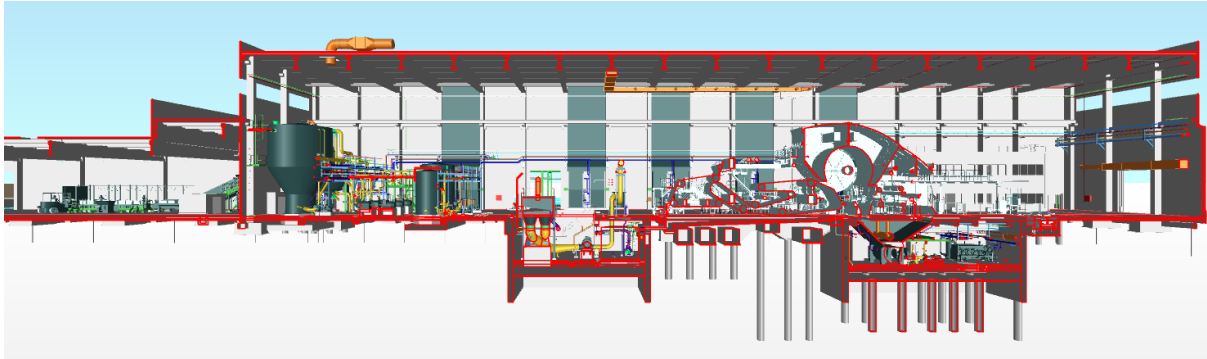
Three-dimensional cross-sectional view of the two-pit solution machine hall layout
